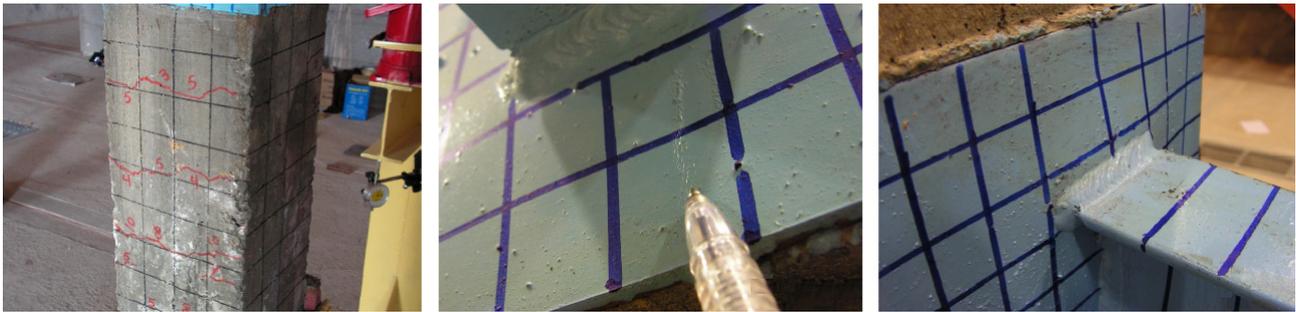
Damage pattern in specimen S4 at 5.0% beam drift
